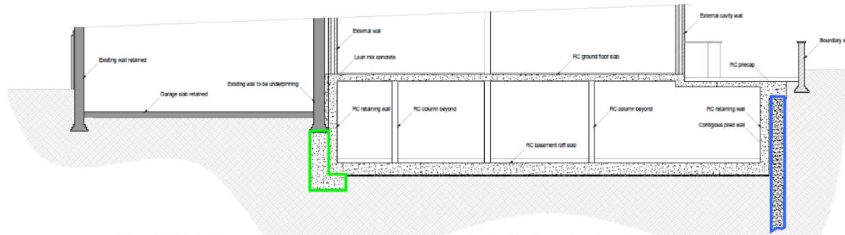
Typical cross section of proposed basement indicating footing (green) and continuous pile wall (blue)
